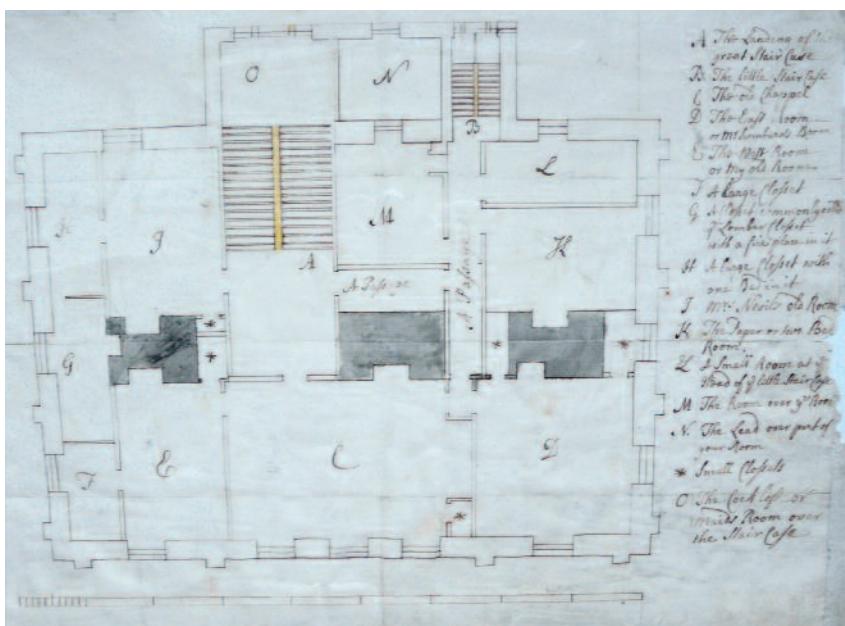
Capheaton Hall: plan of the first floor, probably later than the plan marked '1754'
